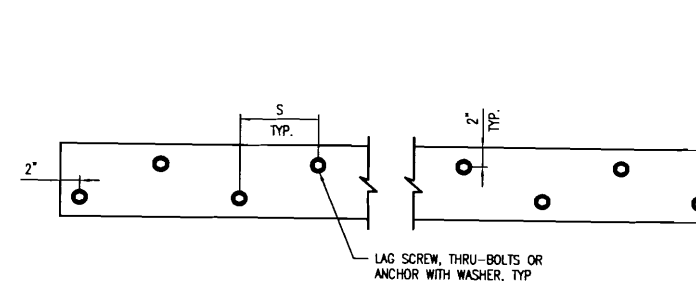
LEDGER BOARD FASTENER SPACING AND CLEARANCES
